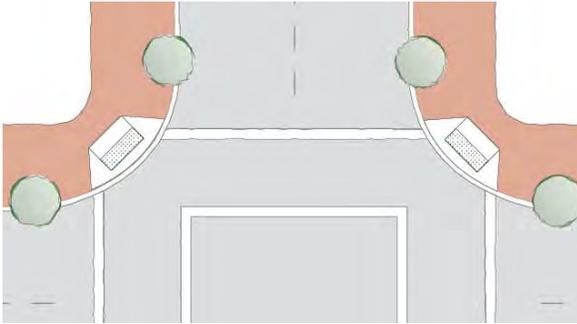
Larger Turning Radii - widen pedestrian crossing and limit amount of sidewalk available for perpendicular curb ramps
